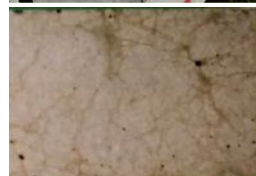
Laboratory test of concrete containing aggregates that are weak for the wet-dry cycle
